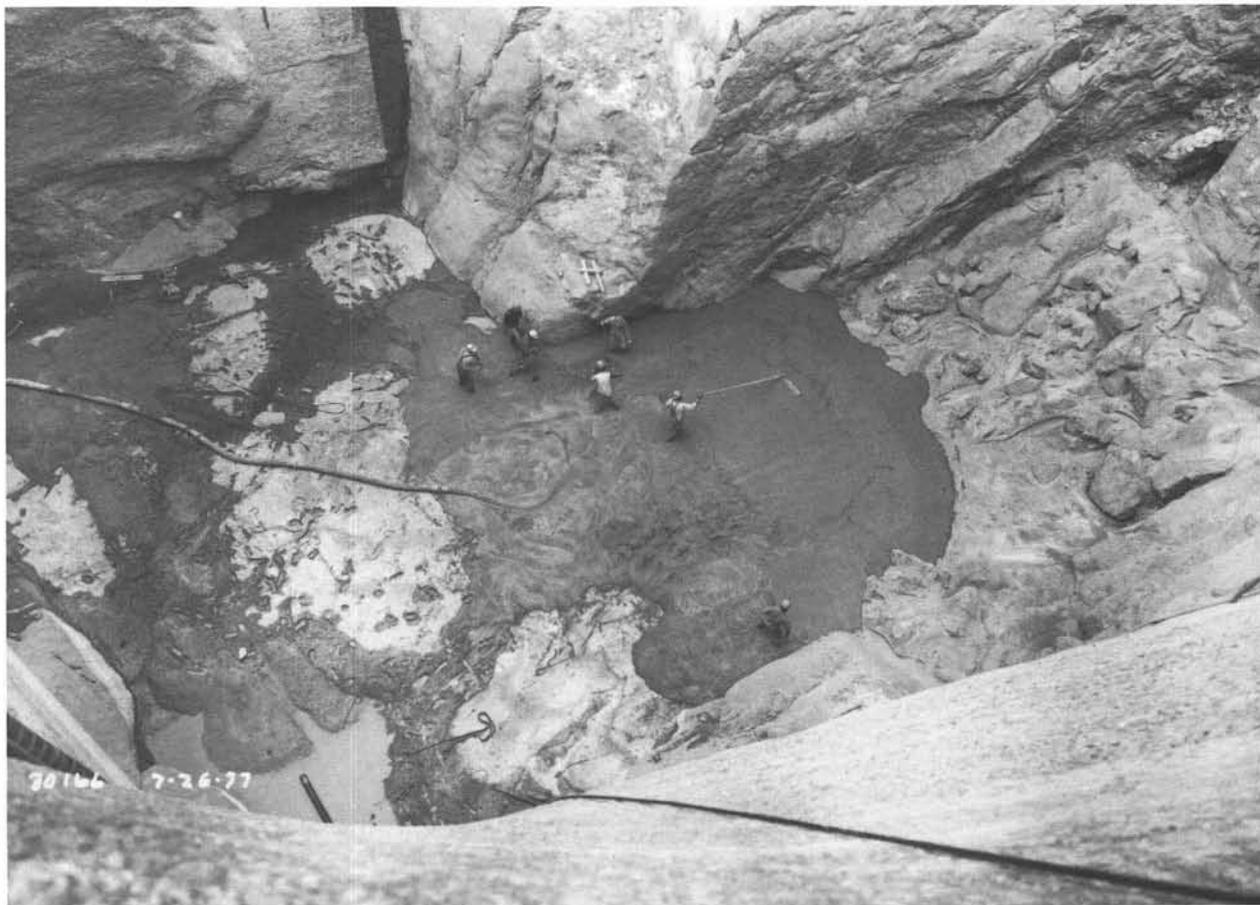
The bottom of the hole excavated by heavy spill at Alder Dam. Photo by Tacoma City Light.
